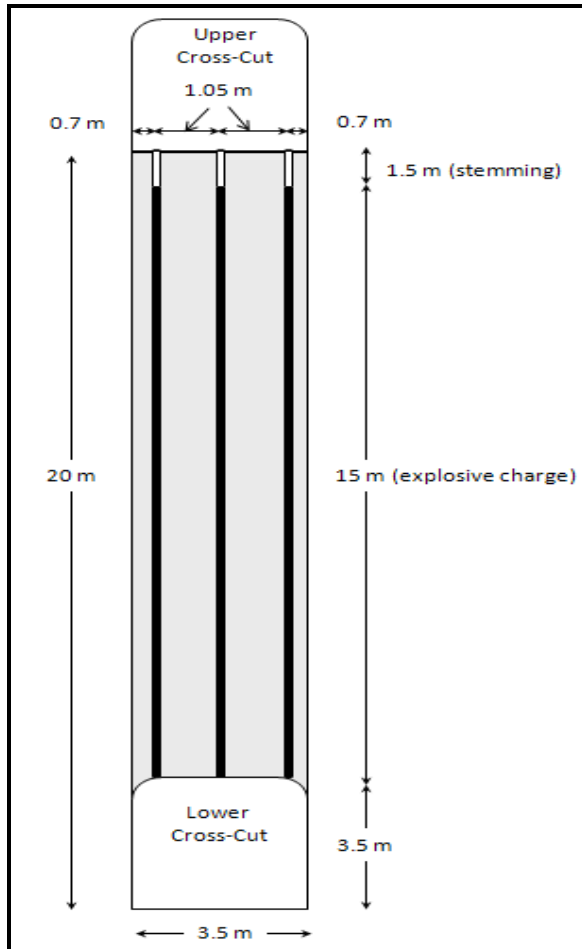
Isometric View of Typical 3.5 m Wide Stope Drill Plan
